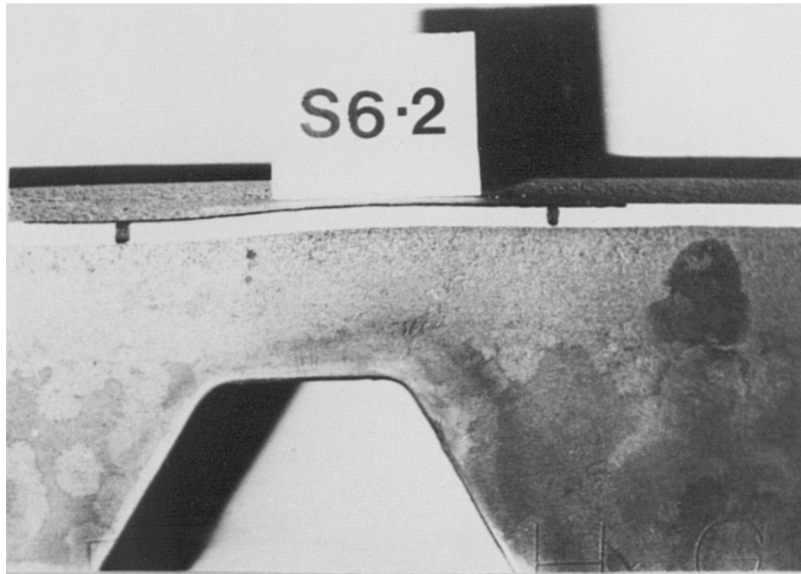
LOCAL BUCKLING FAILURE OF BEAM S6-2
